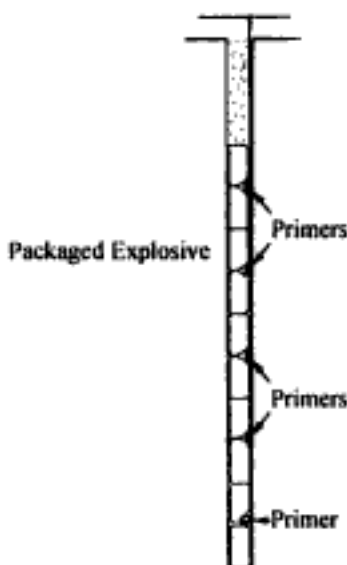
Primer location when using packaged explosives. ICI, Firing With Detonating Cord.
